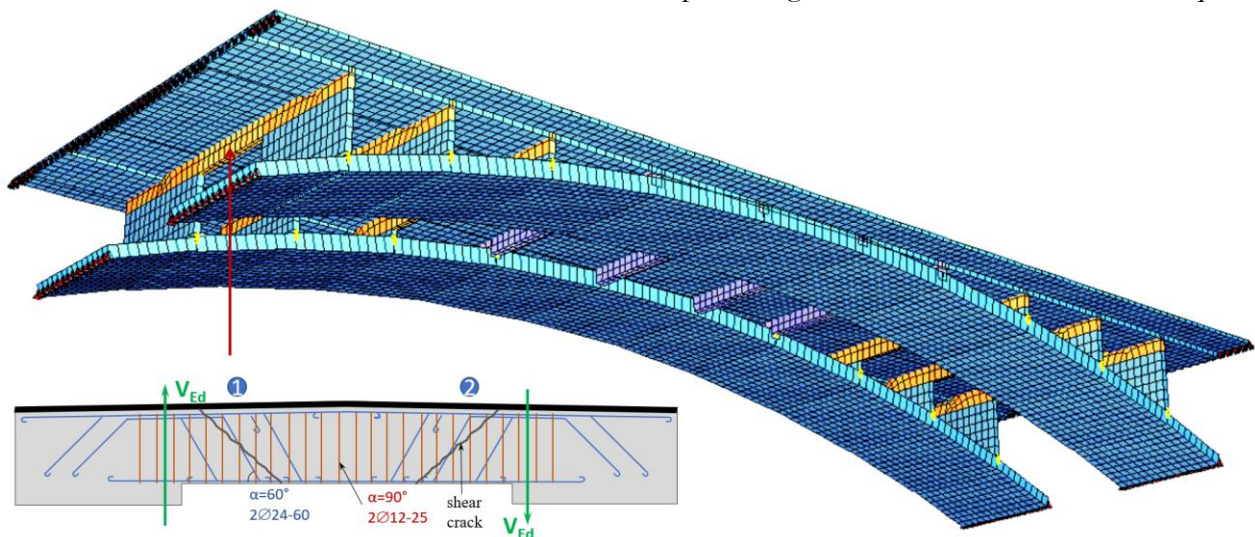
Shear action and shear reinforcement in transverse beams of bridges
